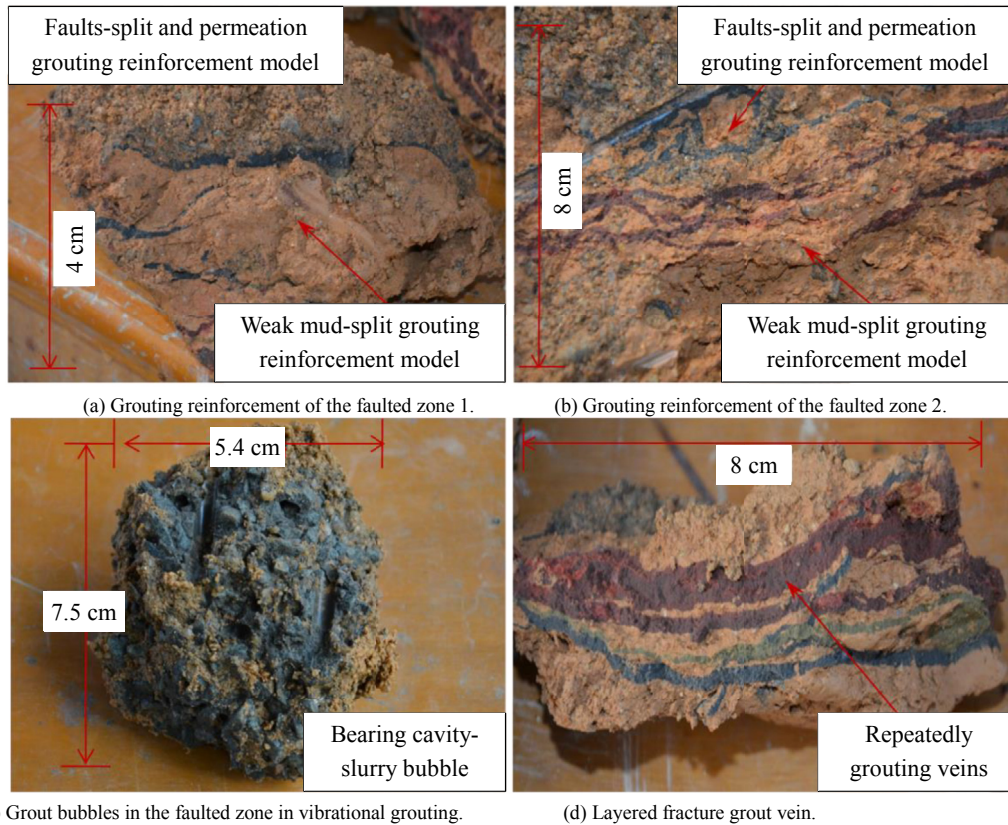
Parts reinforced by grouting: (a) Grouting reinforcement of the faulted zone 1, (b) Grouting reinforcement of the faulted zone 2, (c) Grout bubbles in the faulted zone in vibrational grouting, and (d) Layered fracture grout vein.
